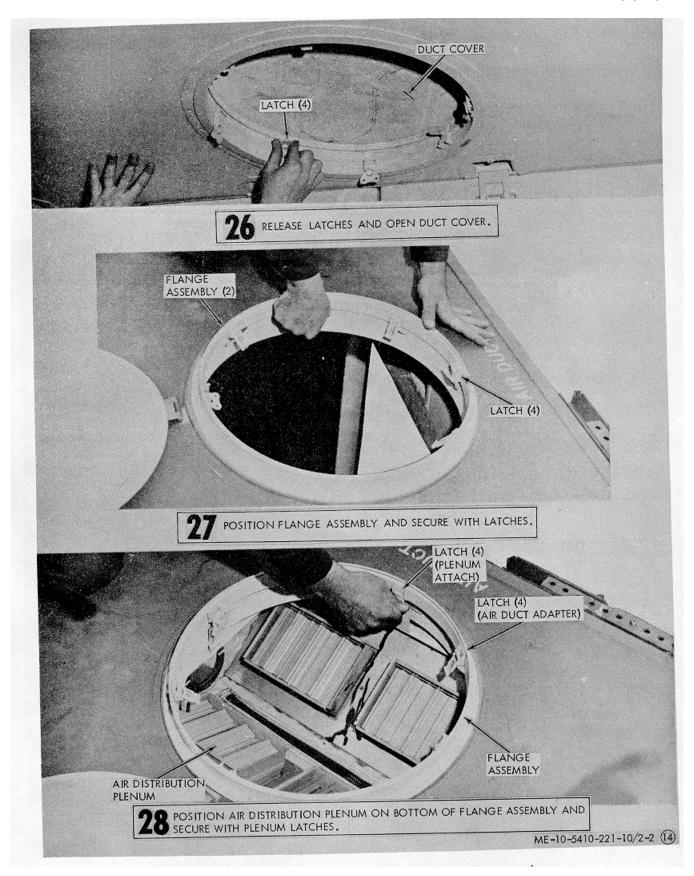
(14). Erection of expandable shelter, (sheet 14 of 18).
